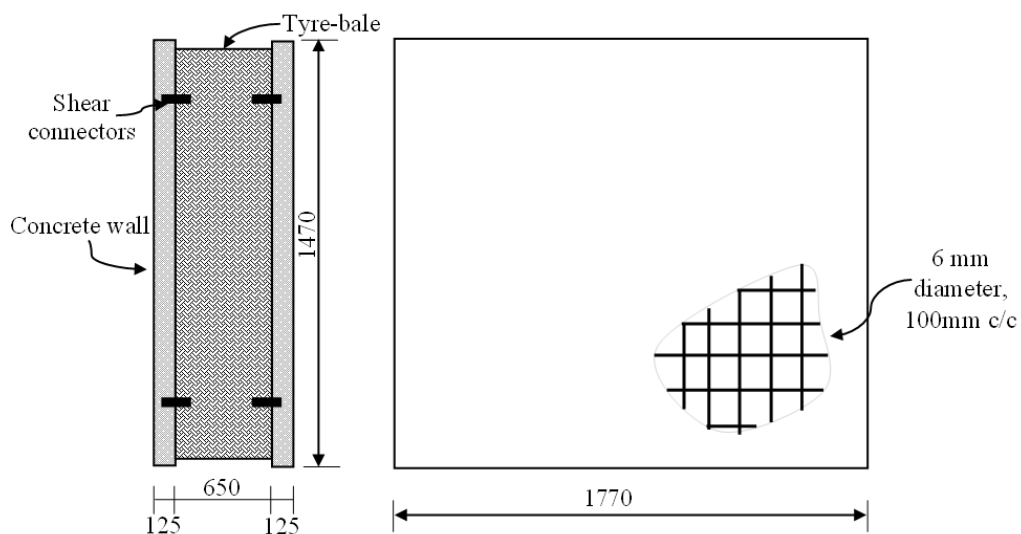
Dimensions and details of sandwich wall (all dimensions are in mm)
